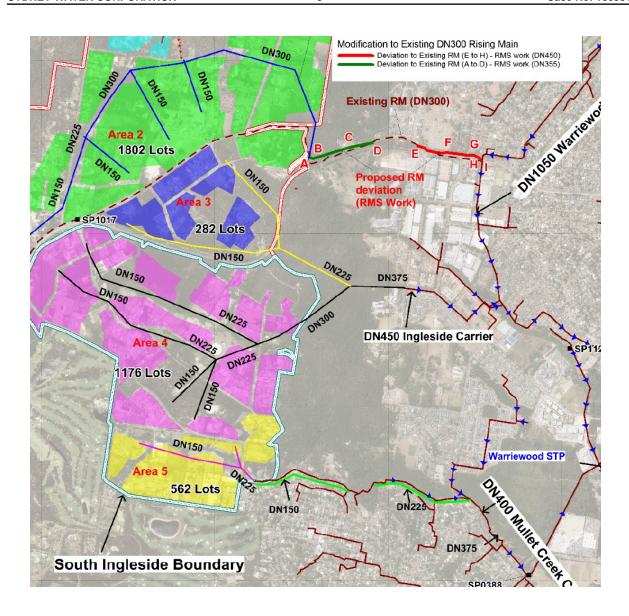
Figure B Preferred wastewater servicing plan (source Ingleside Drinking Water and Wastewater Servicing Options – March 2018)
